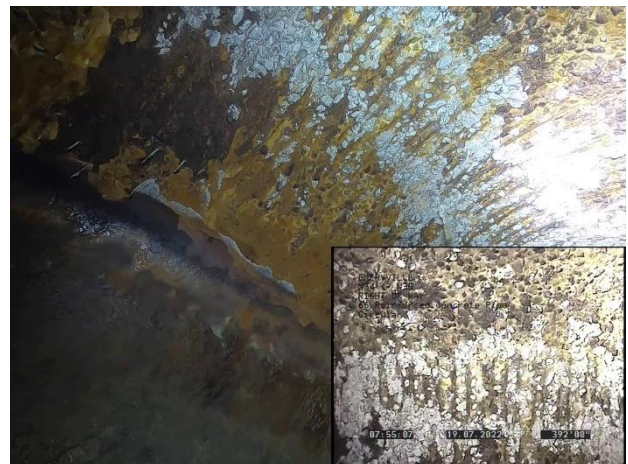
VANDA Level 5 condition with exposed reinforcing steel; 318 feet upstream from N35 up to manhole N34
